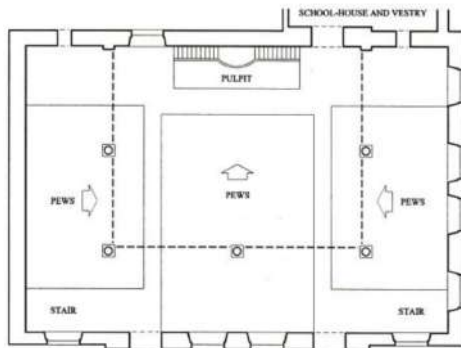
Floor plan of the Neuve Eglise (New French Church) 1743, as restored in 1869 for Wesleyan Methodist use
